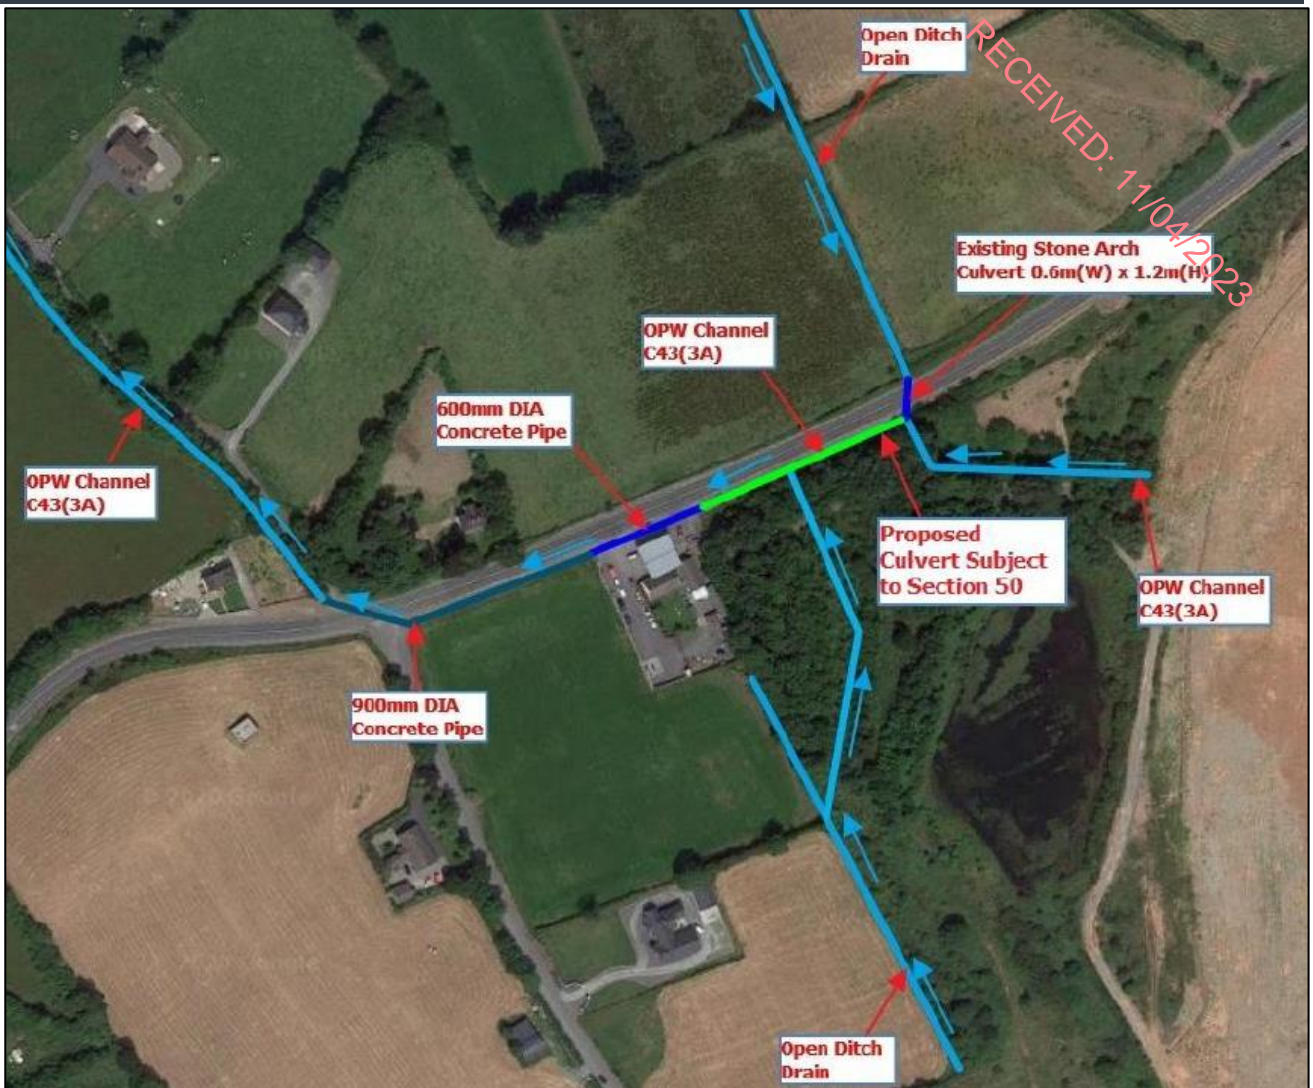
Plan showing existing surface water drainage routes for Knocknacran West (Golder 2020A)
